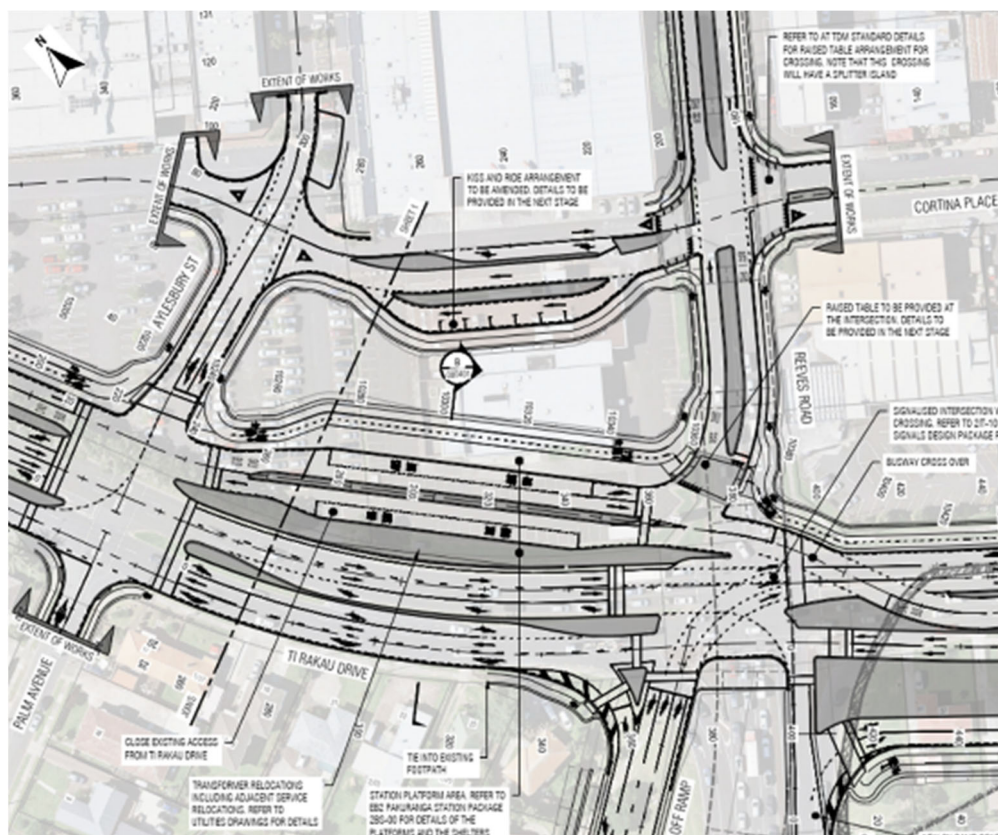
Proposed Pakuranga Town Centre major interchange station layout
